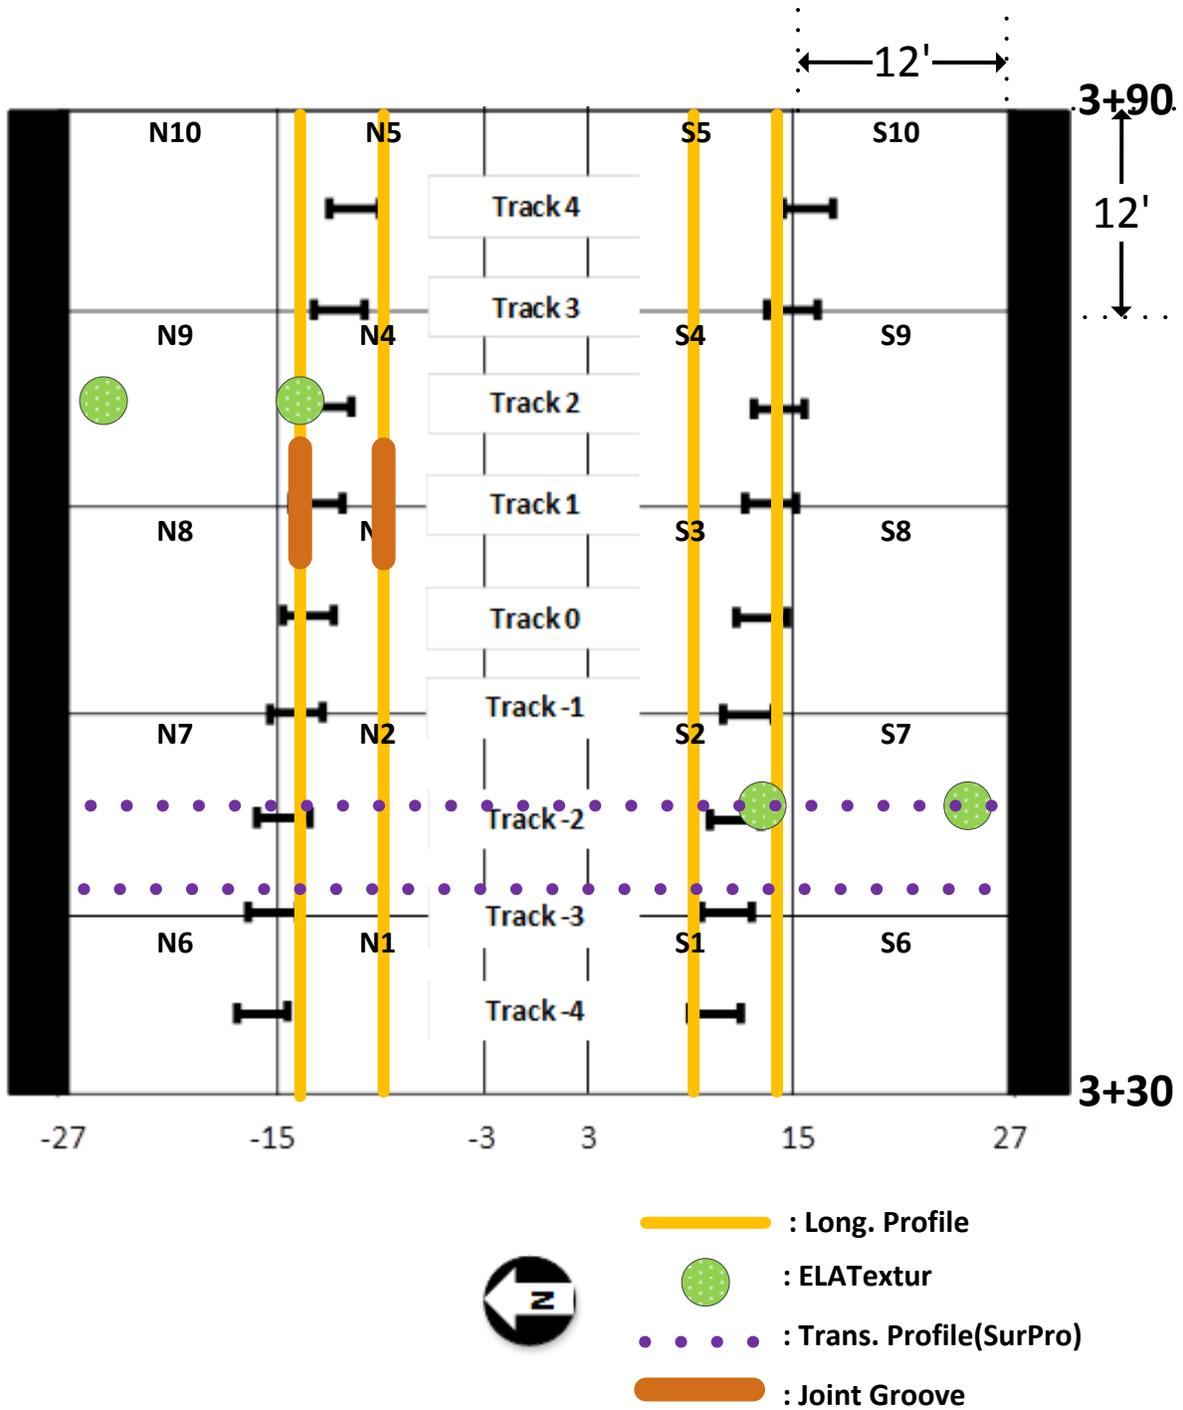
Longitudinal Profile, ELATextur, Transverse Profile, and Joint Groove Profile Test Locations.
